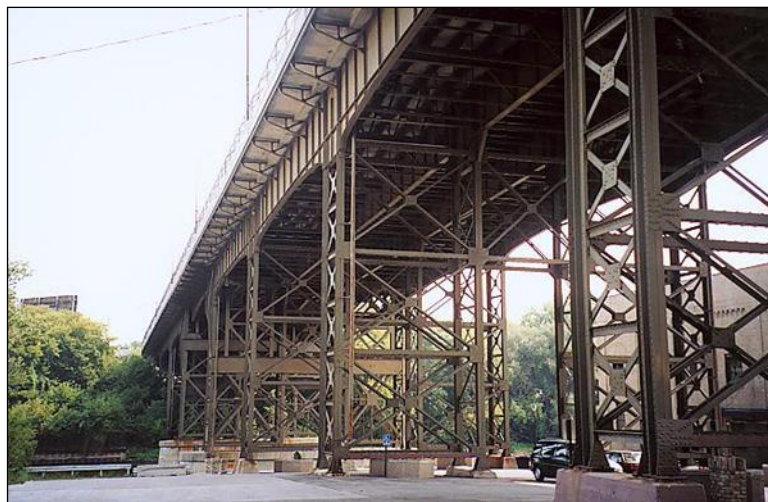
Steel Towers/Trestles – Condition State 1
